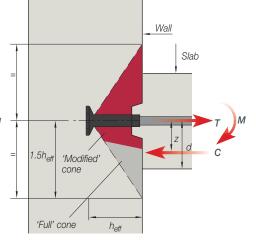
Idealised modified concrete failure. Single line of Anchors is shown.
